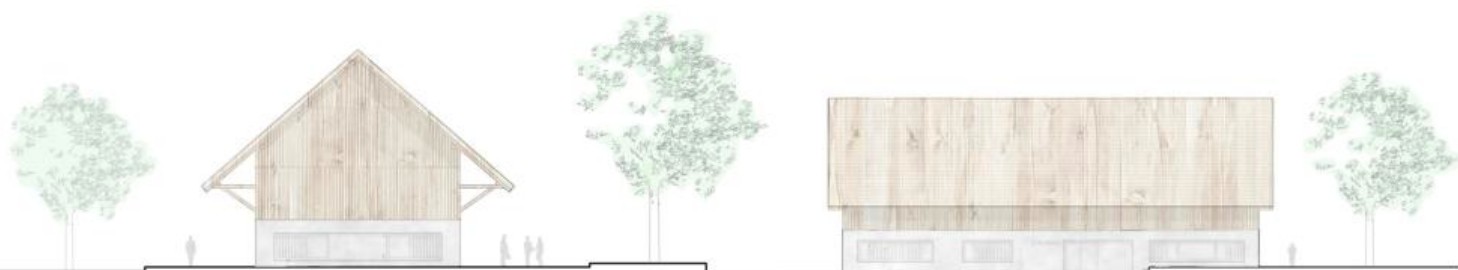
Elevations (ArchDaily, 2020) [Edited by Author]
